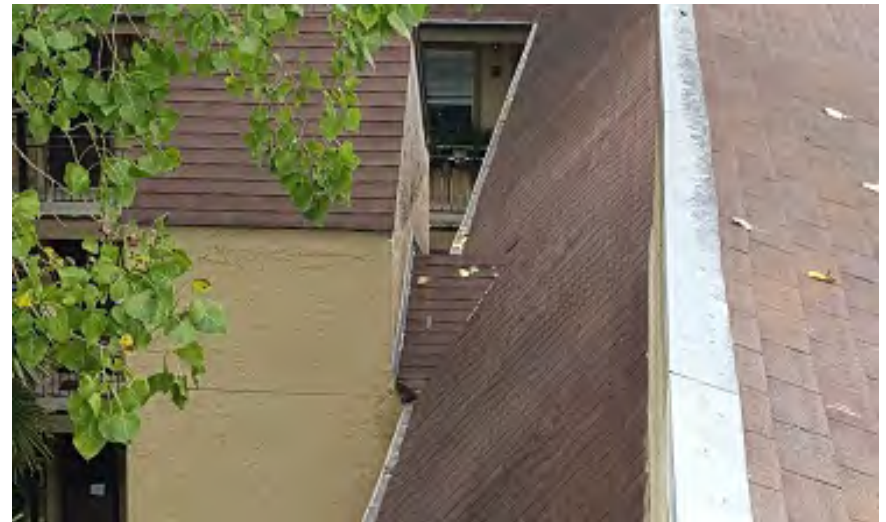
North Building Roof: West End showing Facade Cracks
